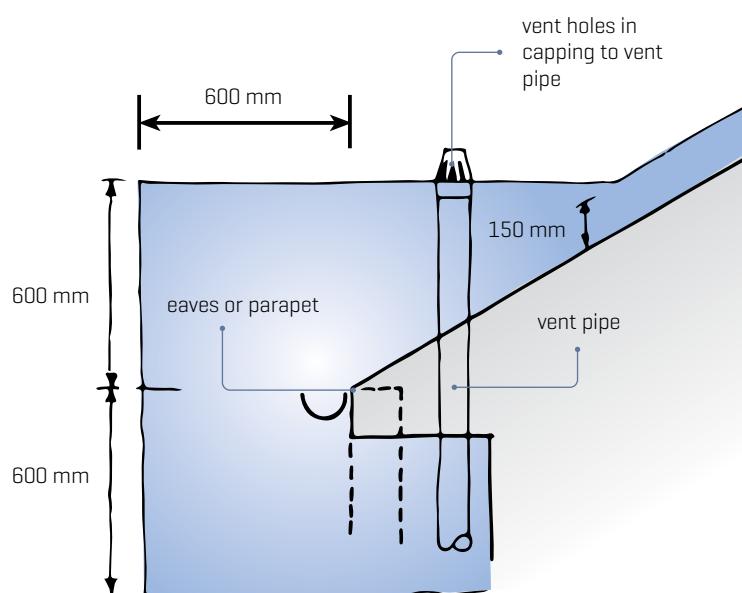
Termination point of vent 600 mm above an eave or parapet and 150 mm above a roof.
